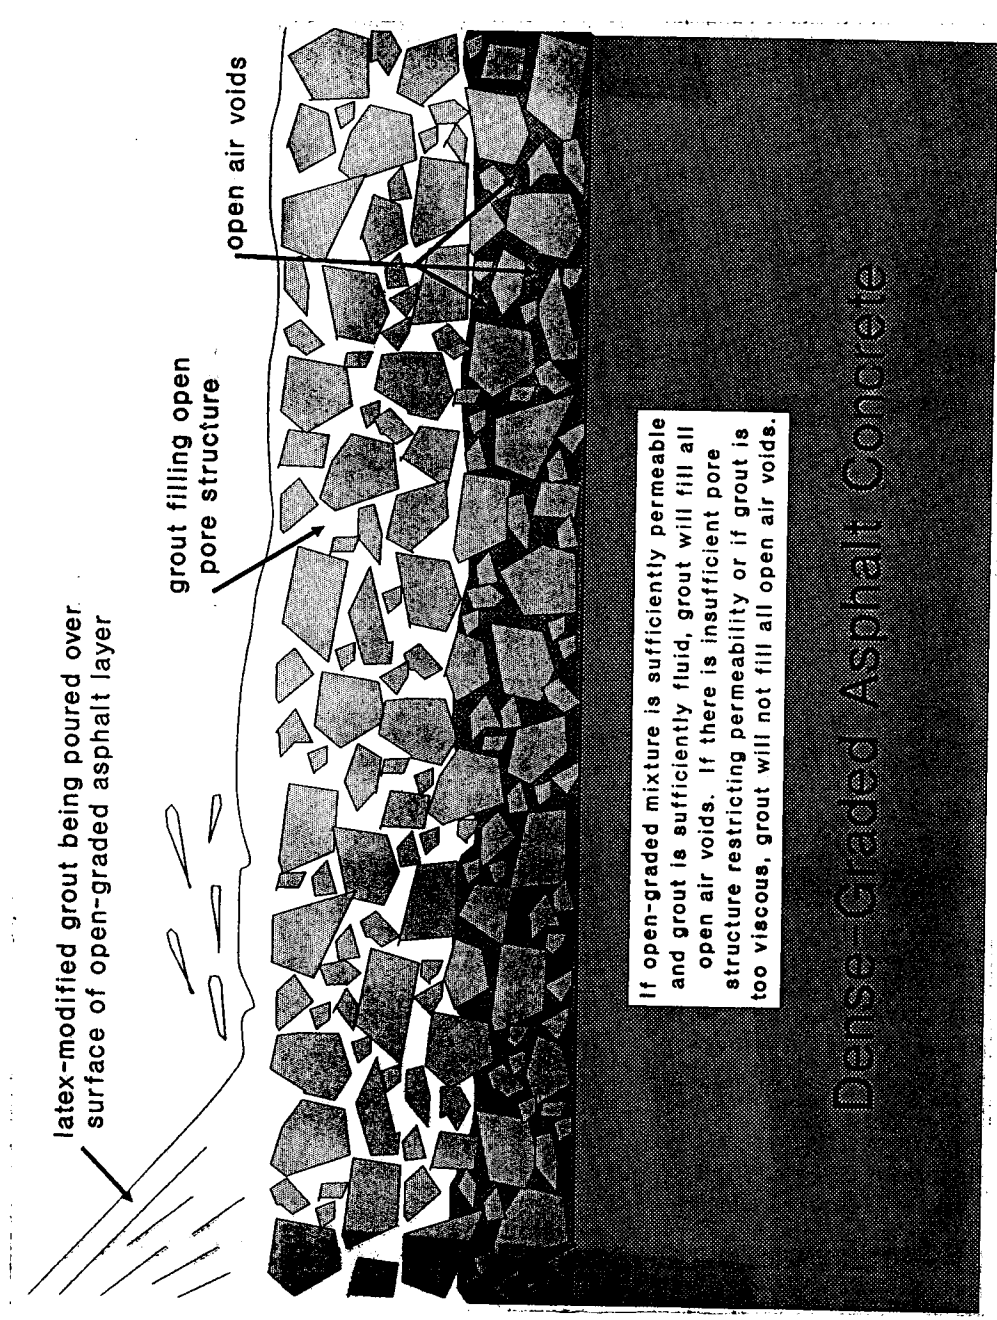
Cross-section of RMP as grout fills internal air voids
